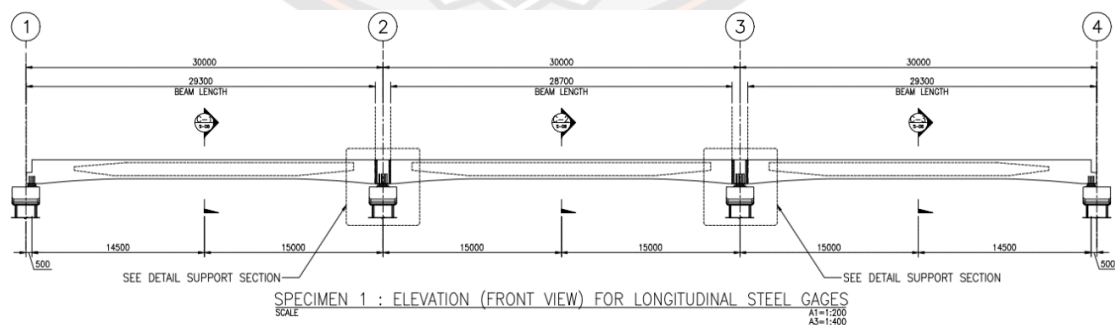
Typical details of steel strain gauges (longitudinal steel bars)
